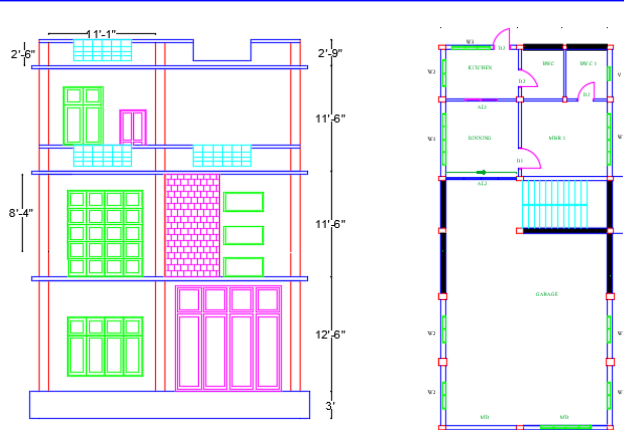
Front elevation and the first floor's plan of the target building. The blue lines in the plan show shear walls for retrofit.
